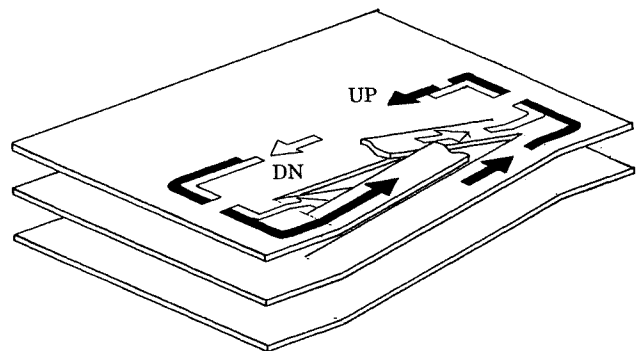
Adjacent-parking type opposed straight-ramp system
